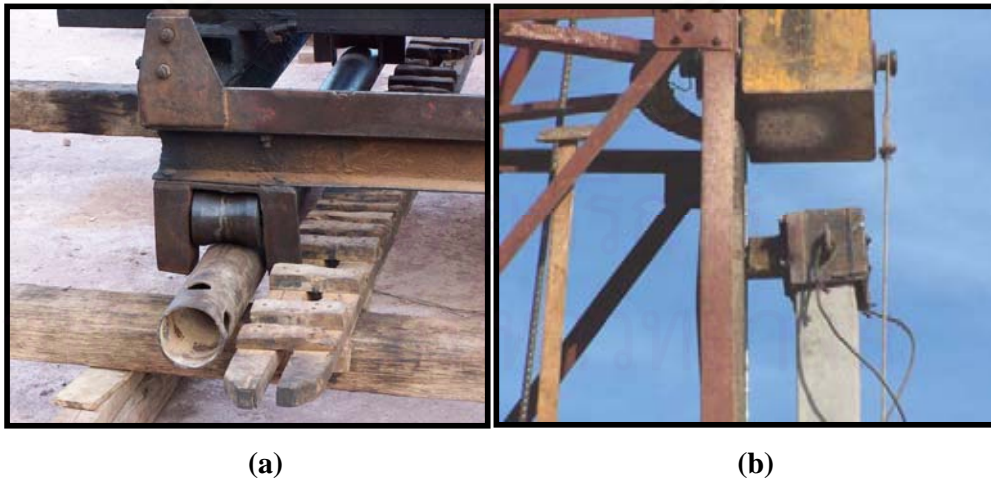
The improper anchor (a) and pile's cap (b) of Malaysian drop-hammer
